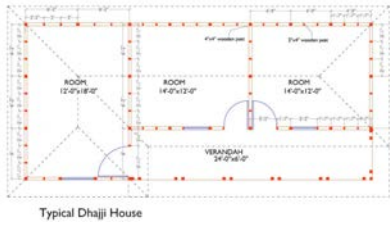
Typical plan view of an engineered Dhajji building after the 2005 Pakistan earthquake.
